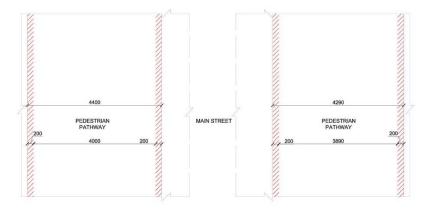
Street width and buffer spaces (in mm) for Gateway 11 in the area surrounding Darmstadt Hauptbahnhof
